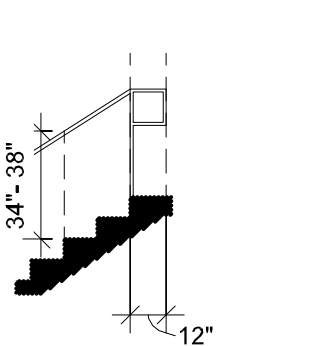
TOP HANDRAIL EXTENSION AT STAIRS
